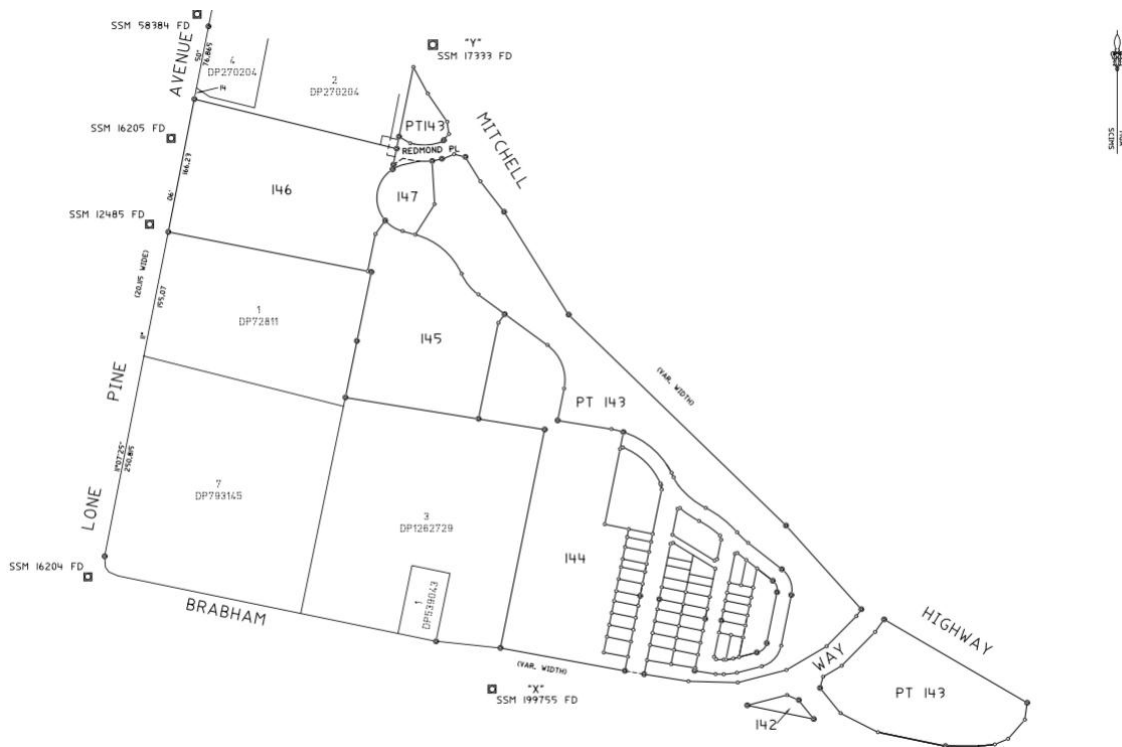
Plan of subdivision, Stage 1, Sheet 1
